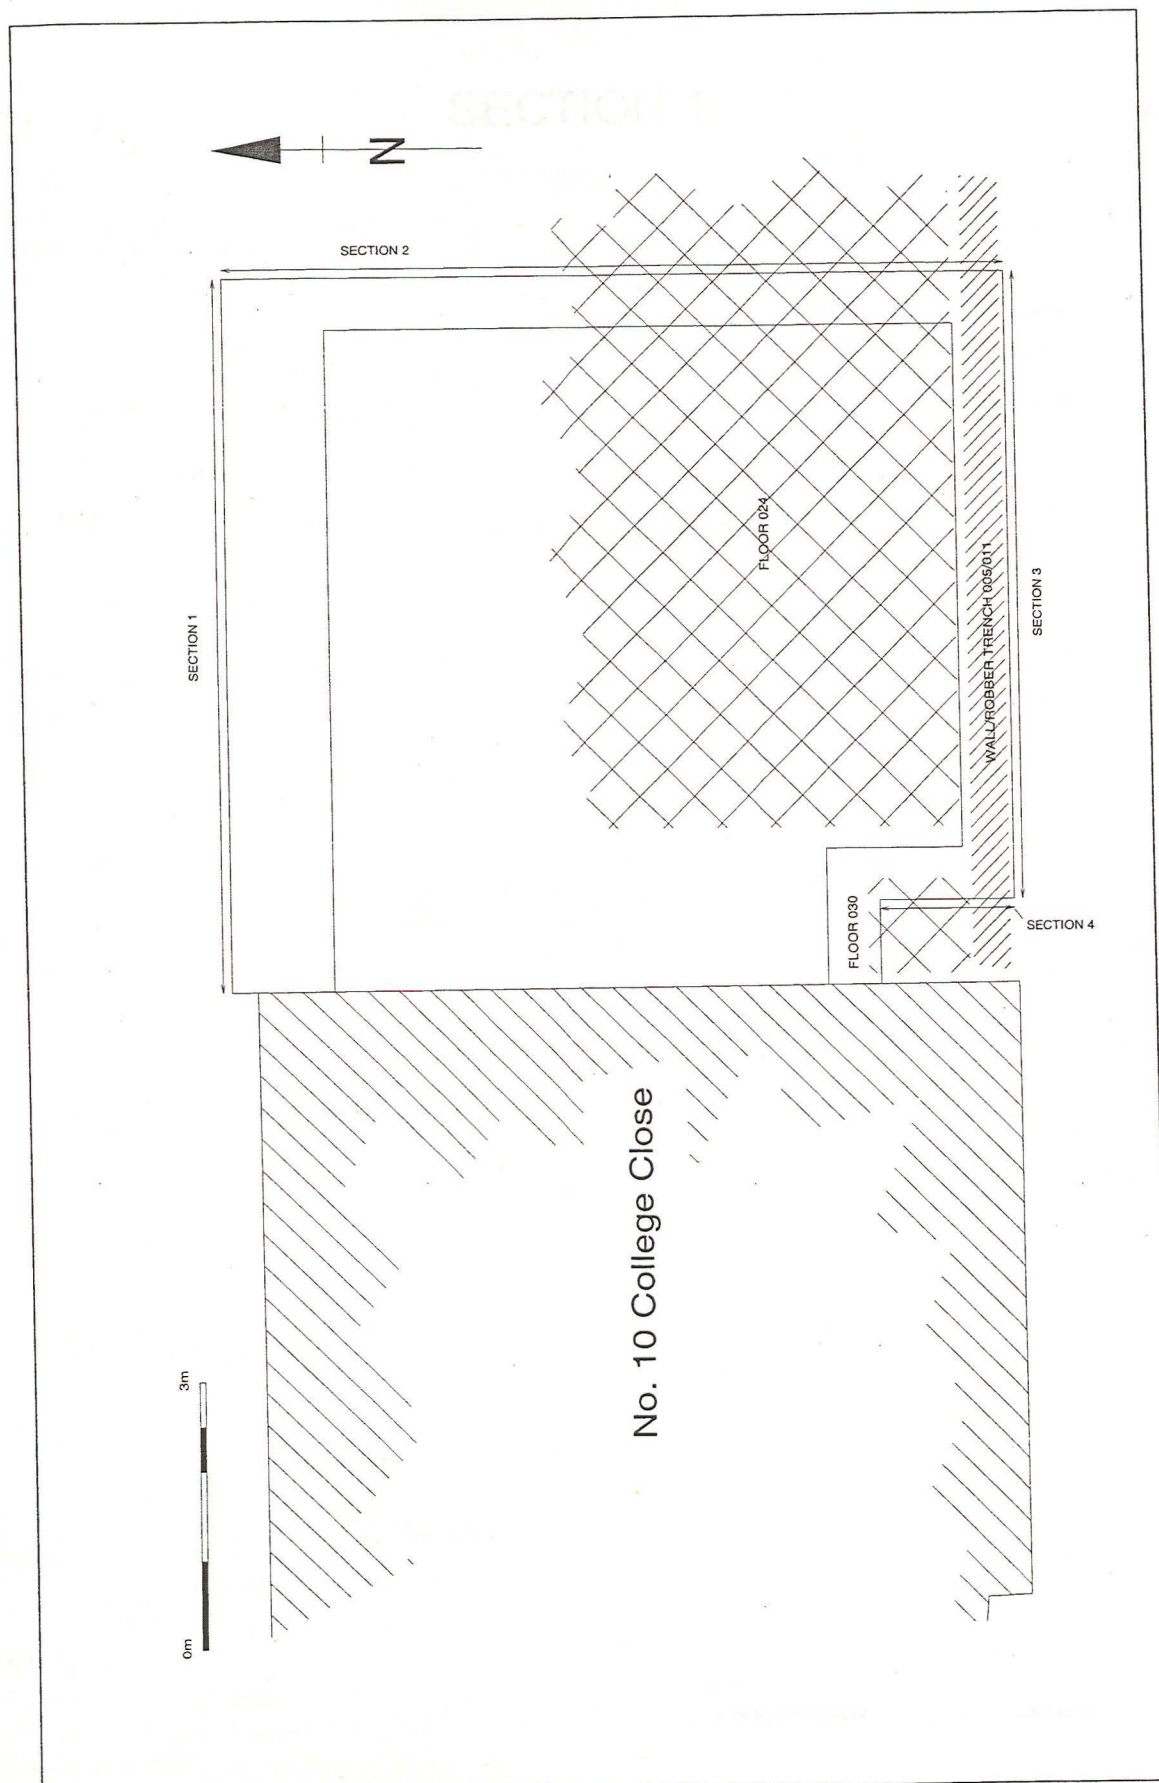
Foundation trench & Section location plan, showing locations of primary features.
